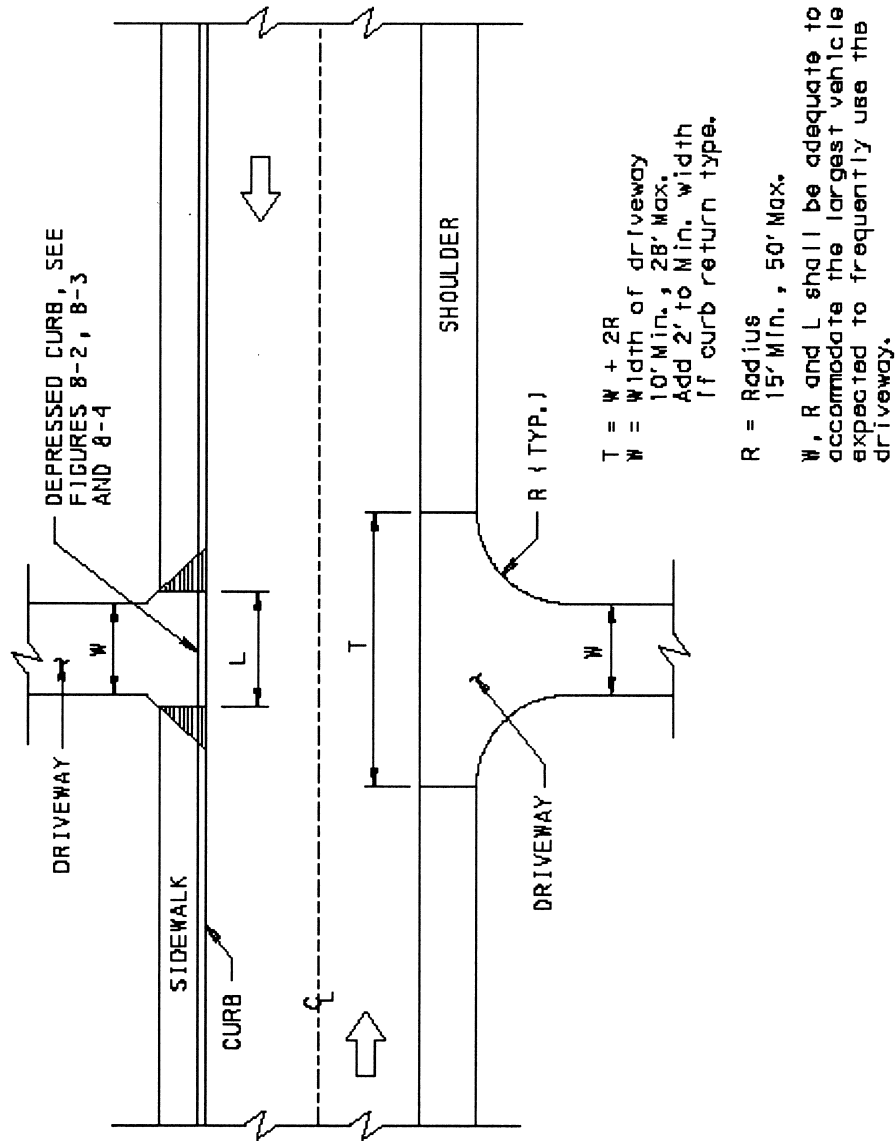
TYPICAL MINIMUM USE DRIVEWAY
